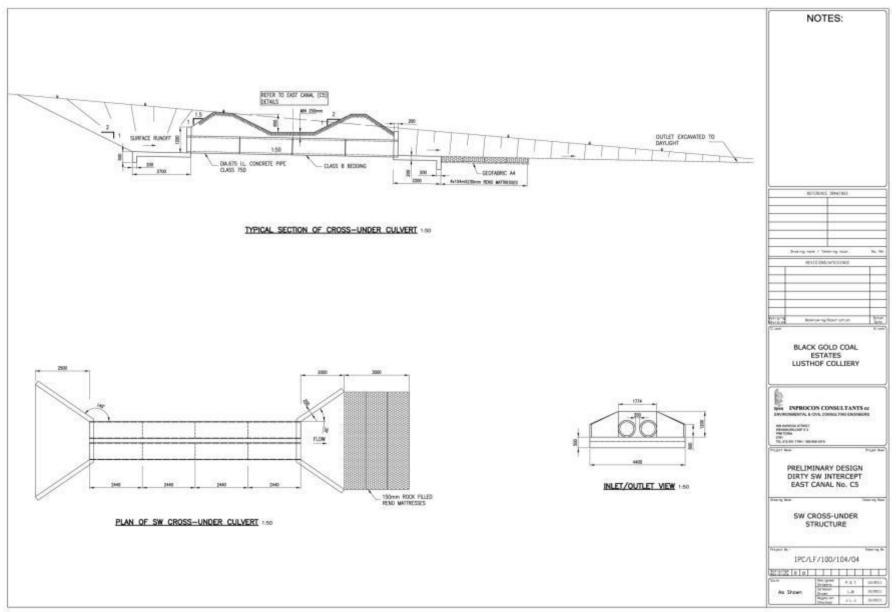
(b): Storm Water Cross-Under Structure.
